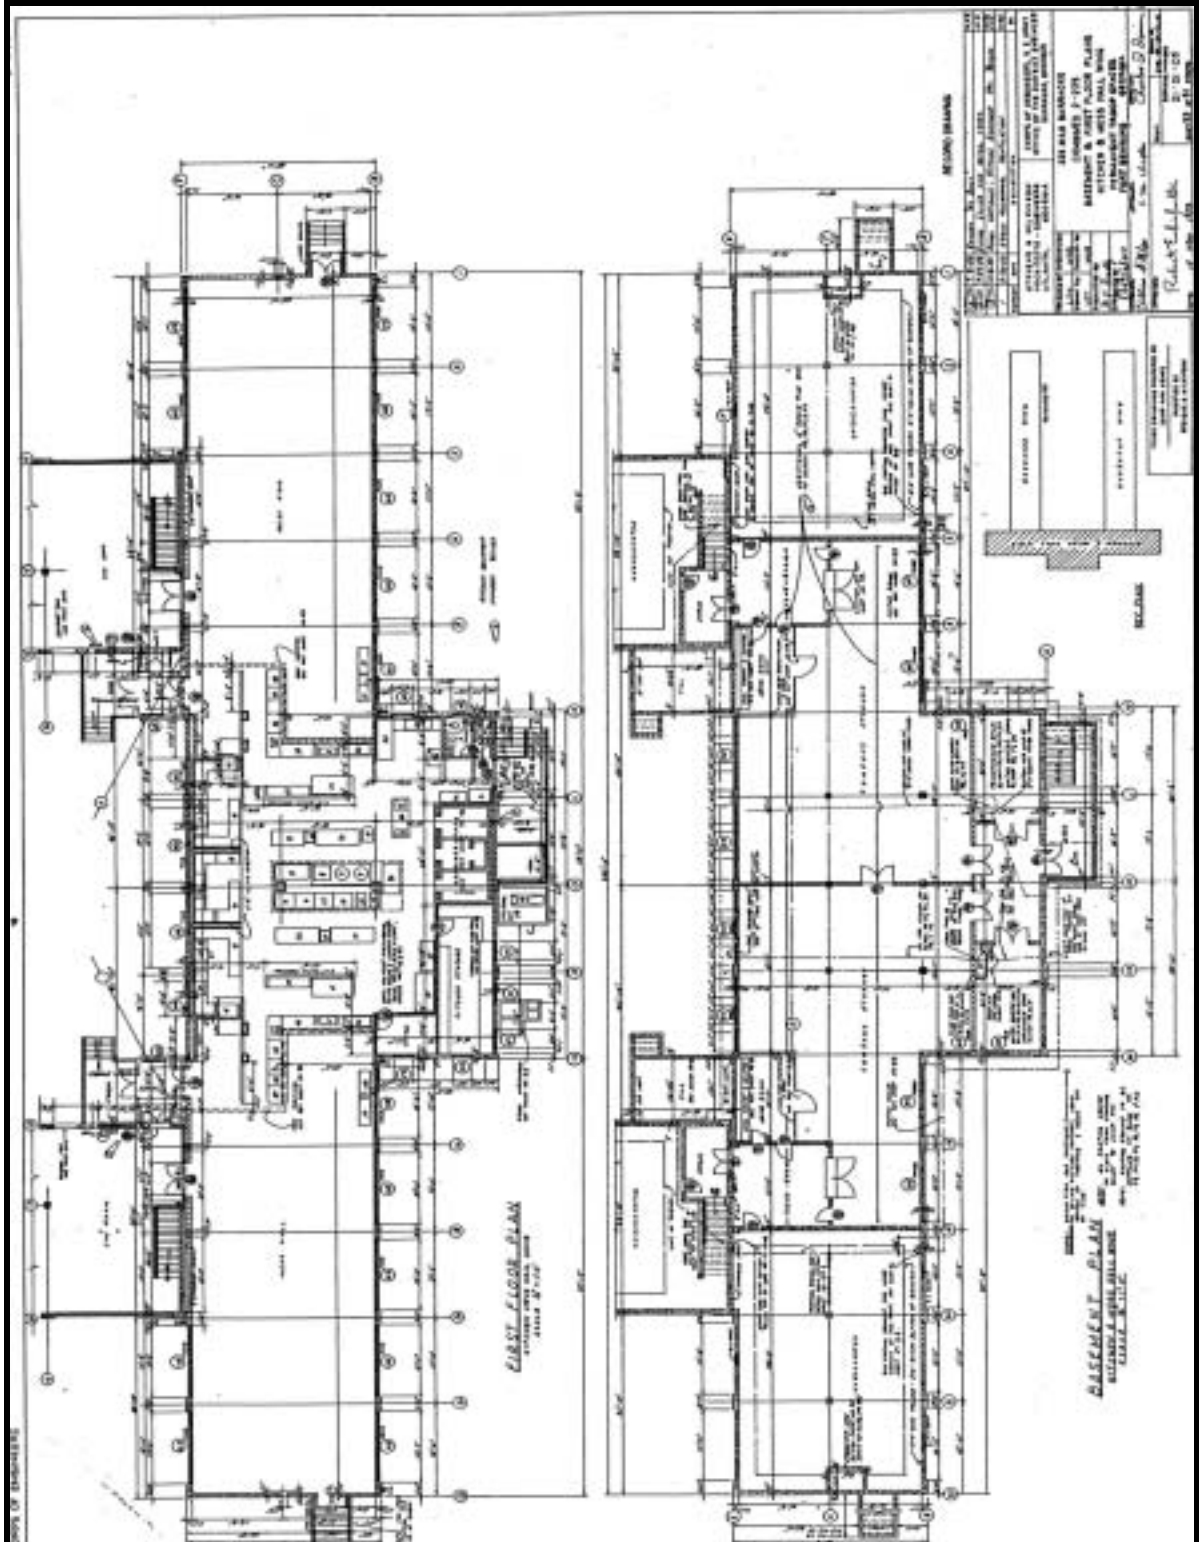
Double hammerhead barracks, floor plan, kitchen and mess hall wing (1952, revised 1954) (Engineering, Ft. Benning).
